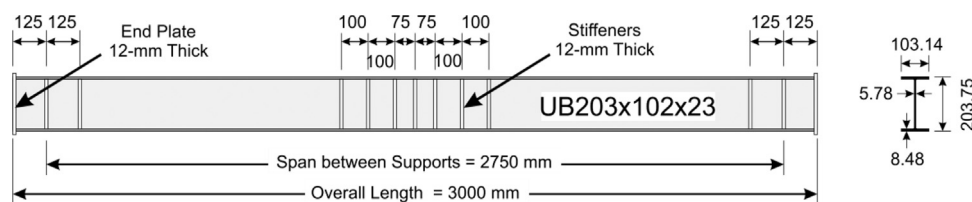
Schematic front view of a typical steel beam specimen [2] (dimensions are in mm).
